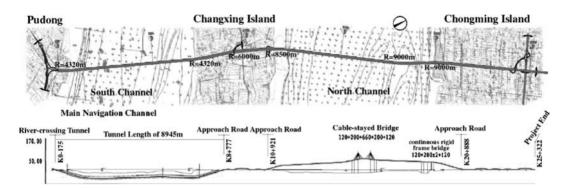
Diagram of Shanghai Yangtze River Tunnel and Bridge.
